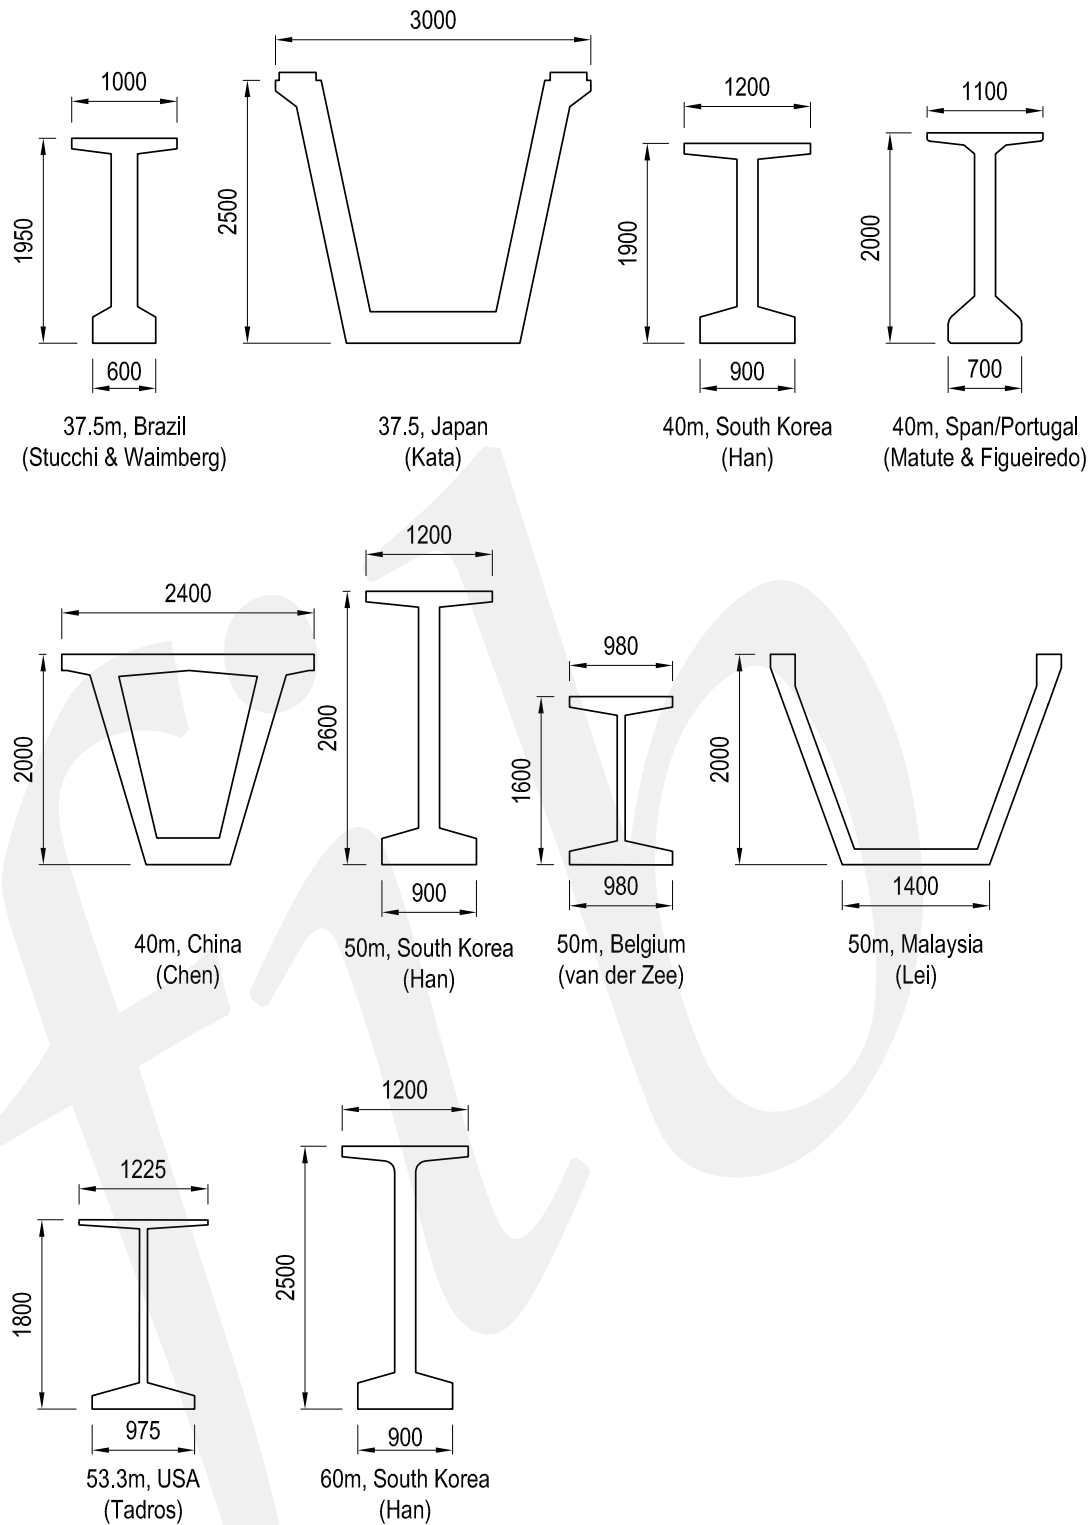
Different girder sections used in the examples included in Section 5. Note: Girder dimensions in the cross sections are in millimeters. 1 mm = 0.0394 in. 1 m = 3.281 ft.
